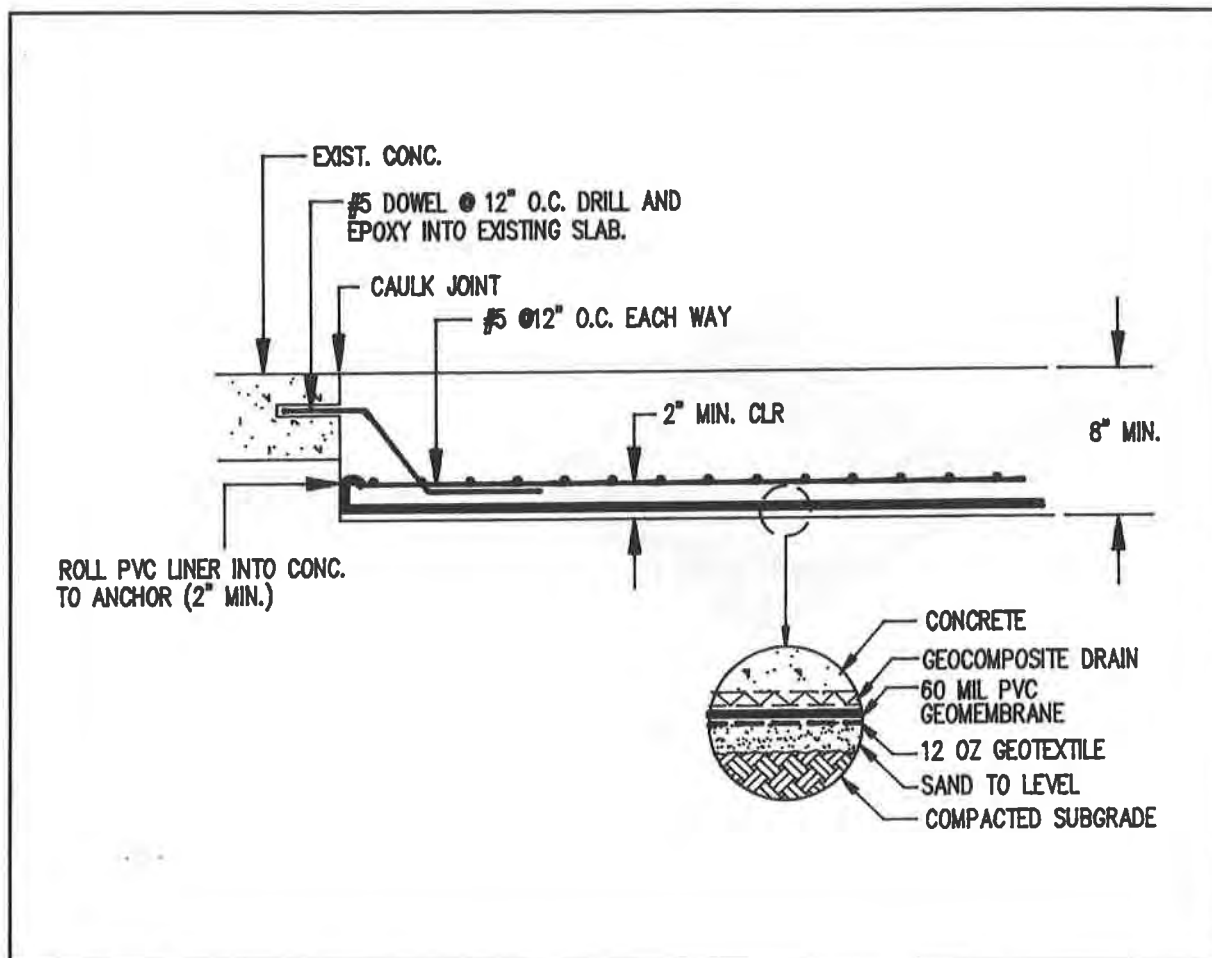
TYPICAL DETAIL OF CONCRETE ON EXISTING PAVEMENT USING SHEET GEOMEMBRANE
